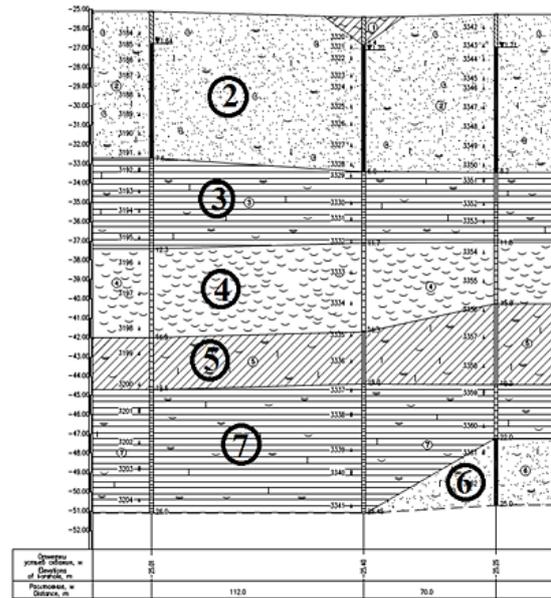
Geotechnical cross-sections on the construction site on Tengiz
